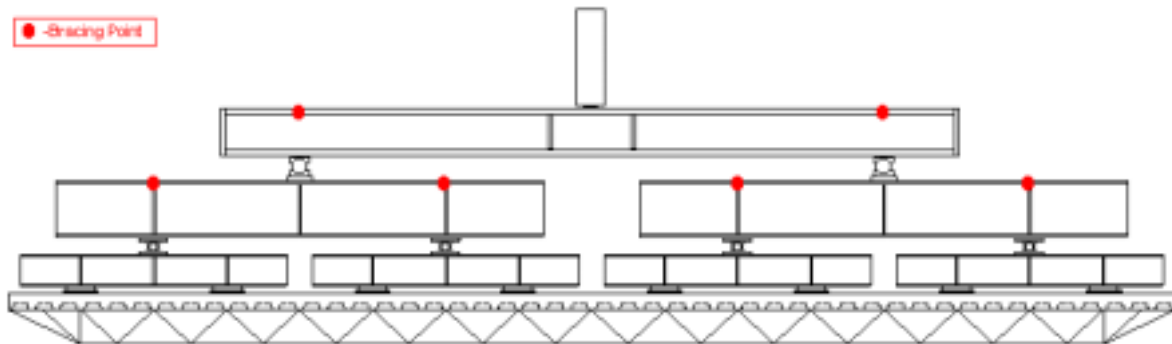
Single Joist Test (CSJ-13) Loading System Arrangements (Mujagic et al. 2000)
